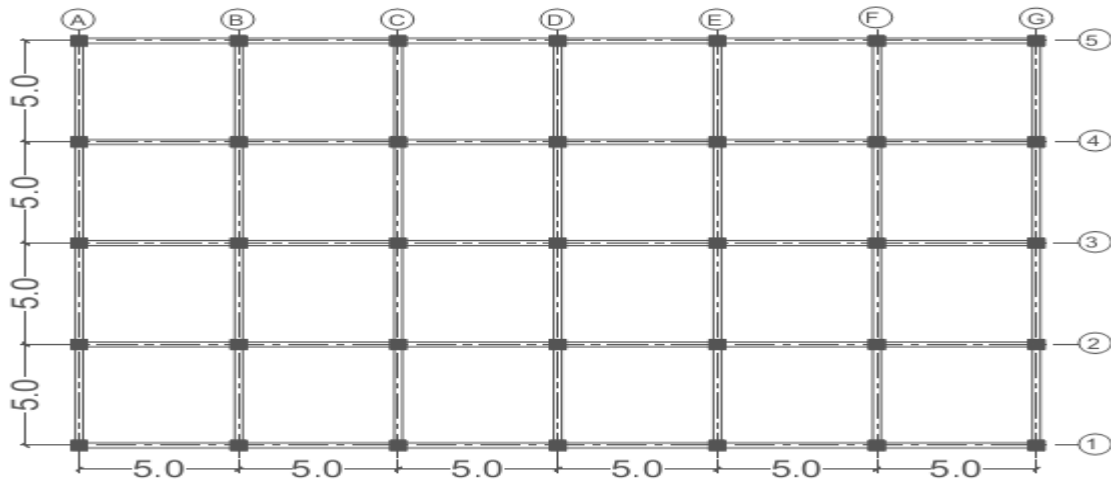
Typical structural layout of building Model 1 (G+5)
